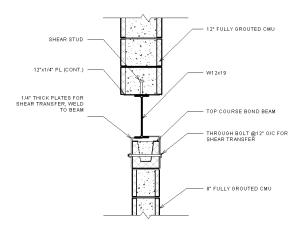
HYBRID SHEAR WALL CONNECTIONS
